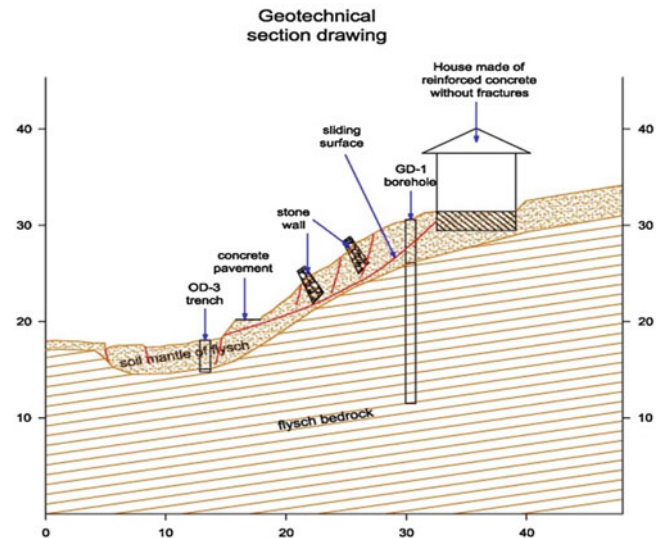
Geotechnical section drawing, showing the status of sliding slope as it looks after the last landslide
